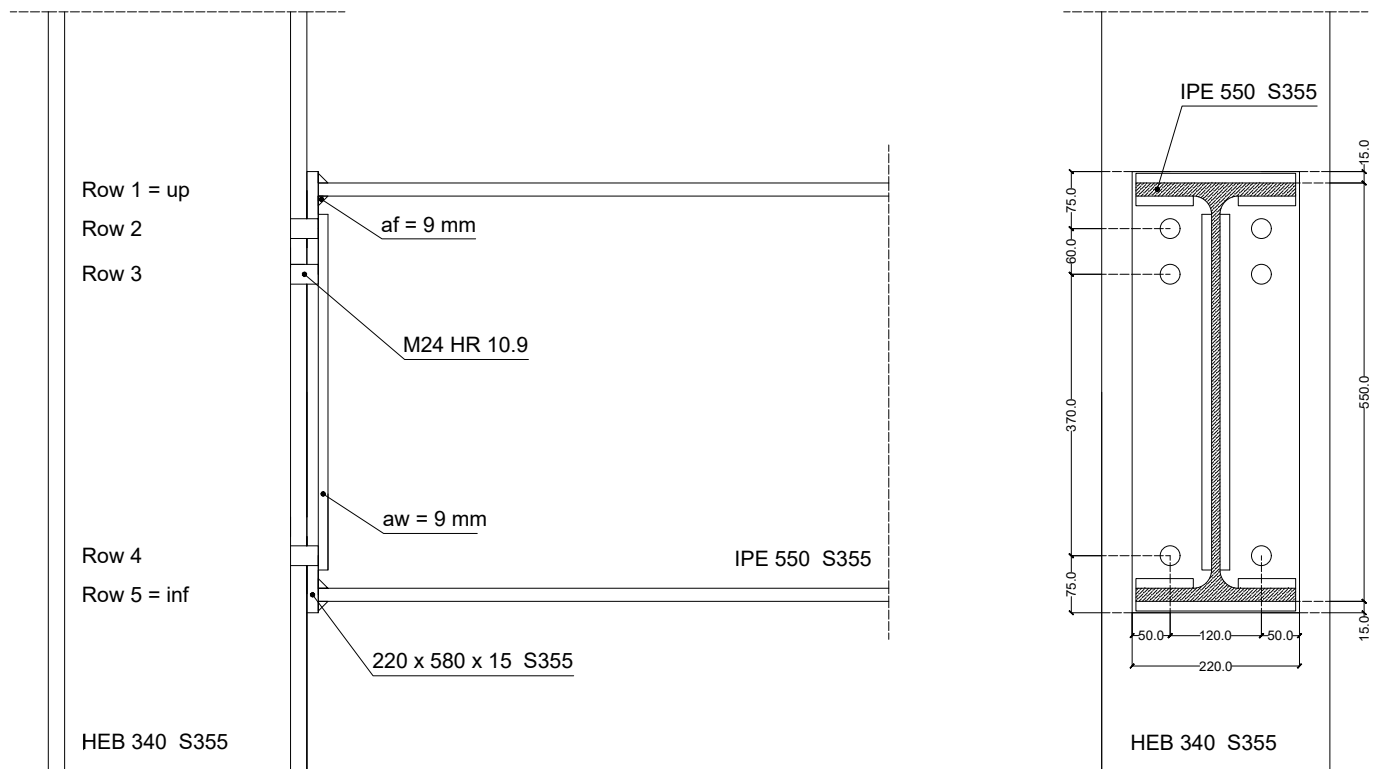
FAILNOMORE - Joint configuration B1 - Technical drawing
